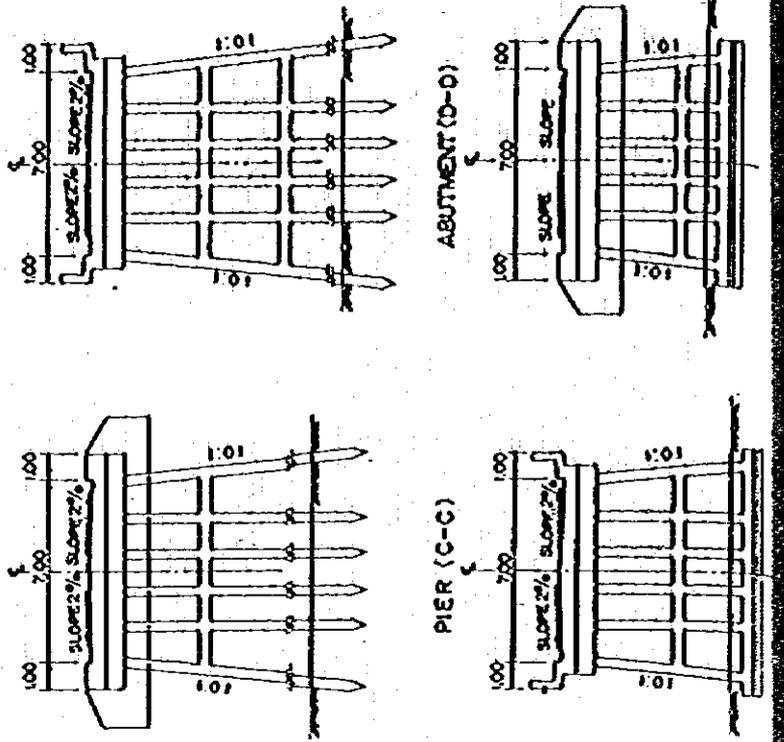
LONG SPAN BRIDGE AT LI RIVER
